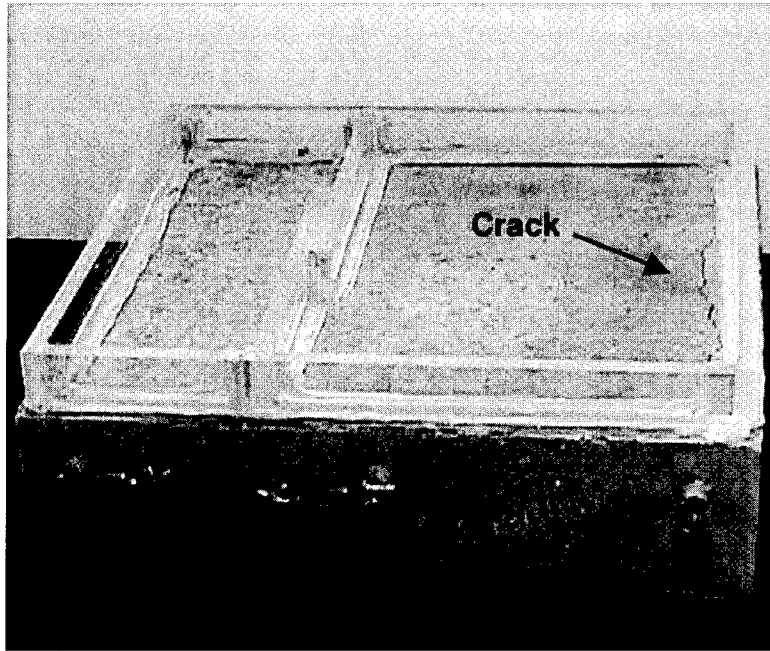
Photograph of concrete slab 11-C showing cracking over right steel bar and none over the center steel bar.
